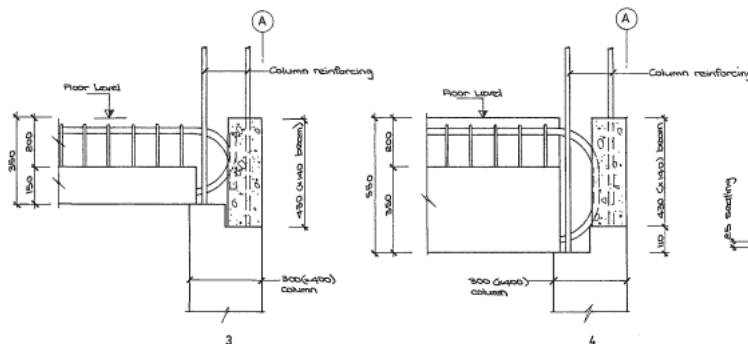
Reinforcement anchorage in Grid A beam column joint zone (Design Engineer 1986a)
